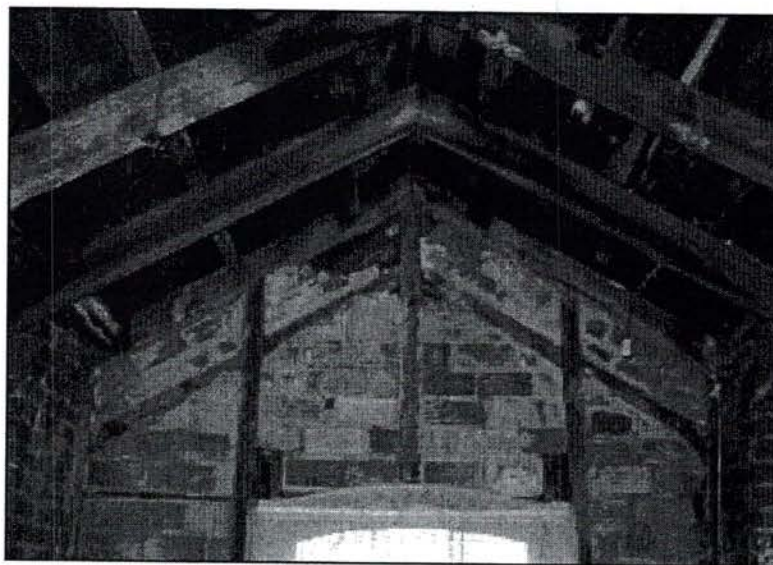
View looking to the northern gable in the attic of the main section of the house showing the framing and brick nogging.
